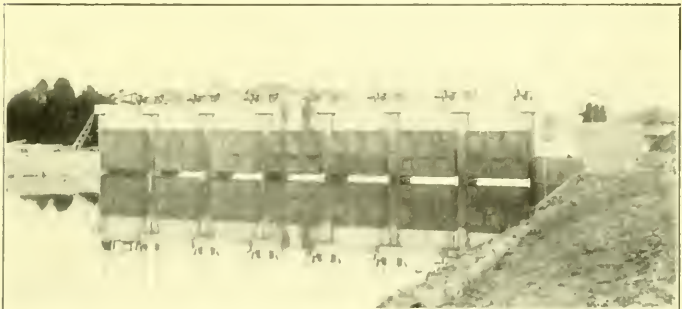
MAIN CANAL. CHECK AND WASTEWAY.
